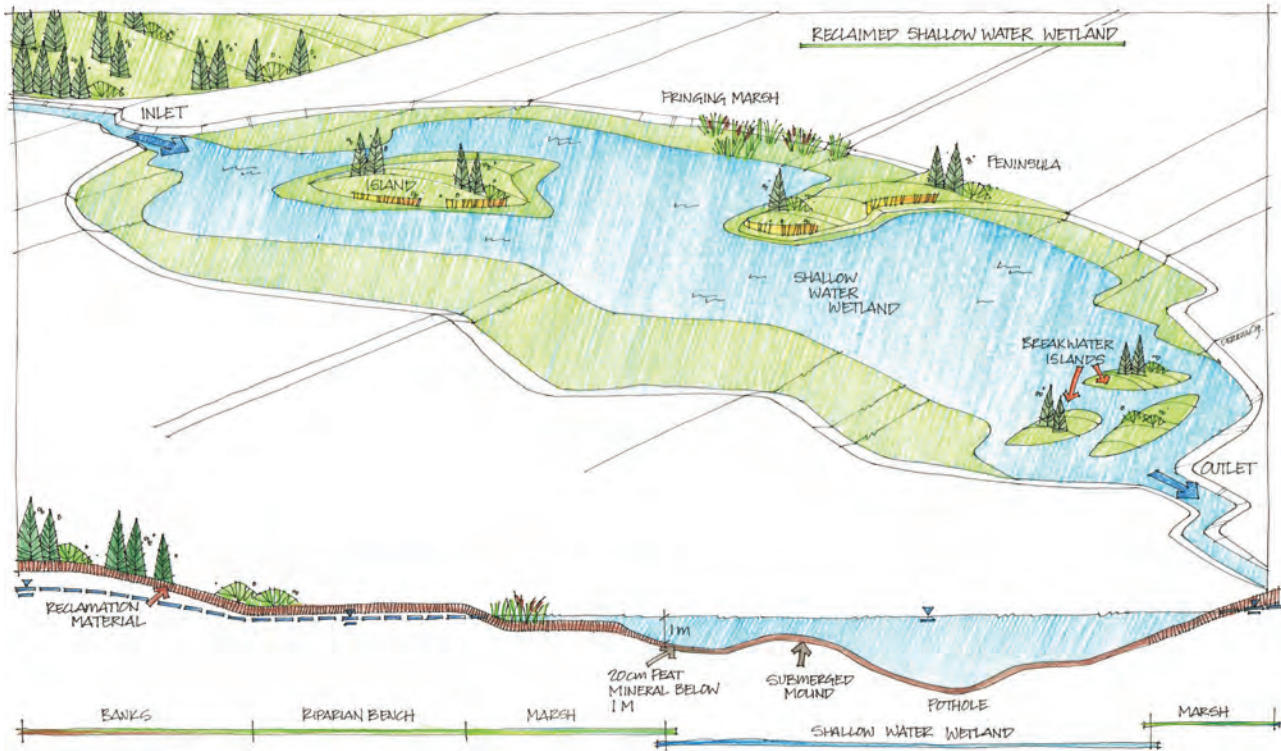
Design elements for a reclaimed shallow-water wetland.
